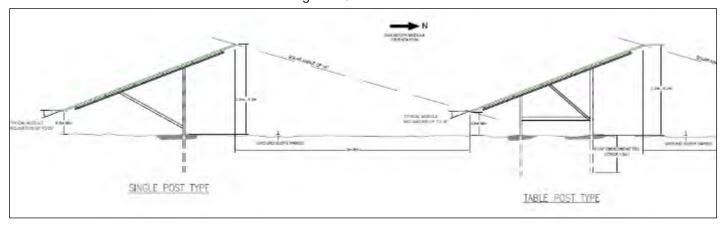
Typical Cross Sections - Single Post and Table Post Ground Mounting Systems
